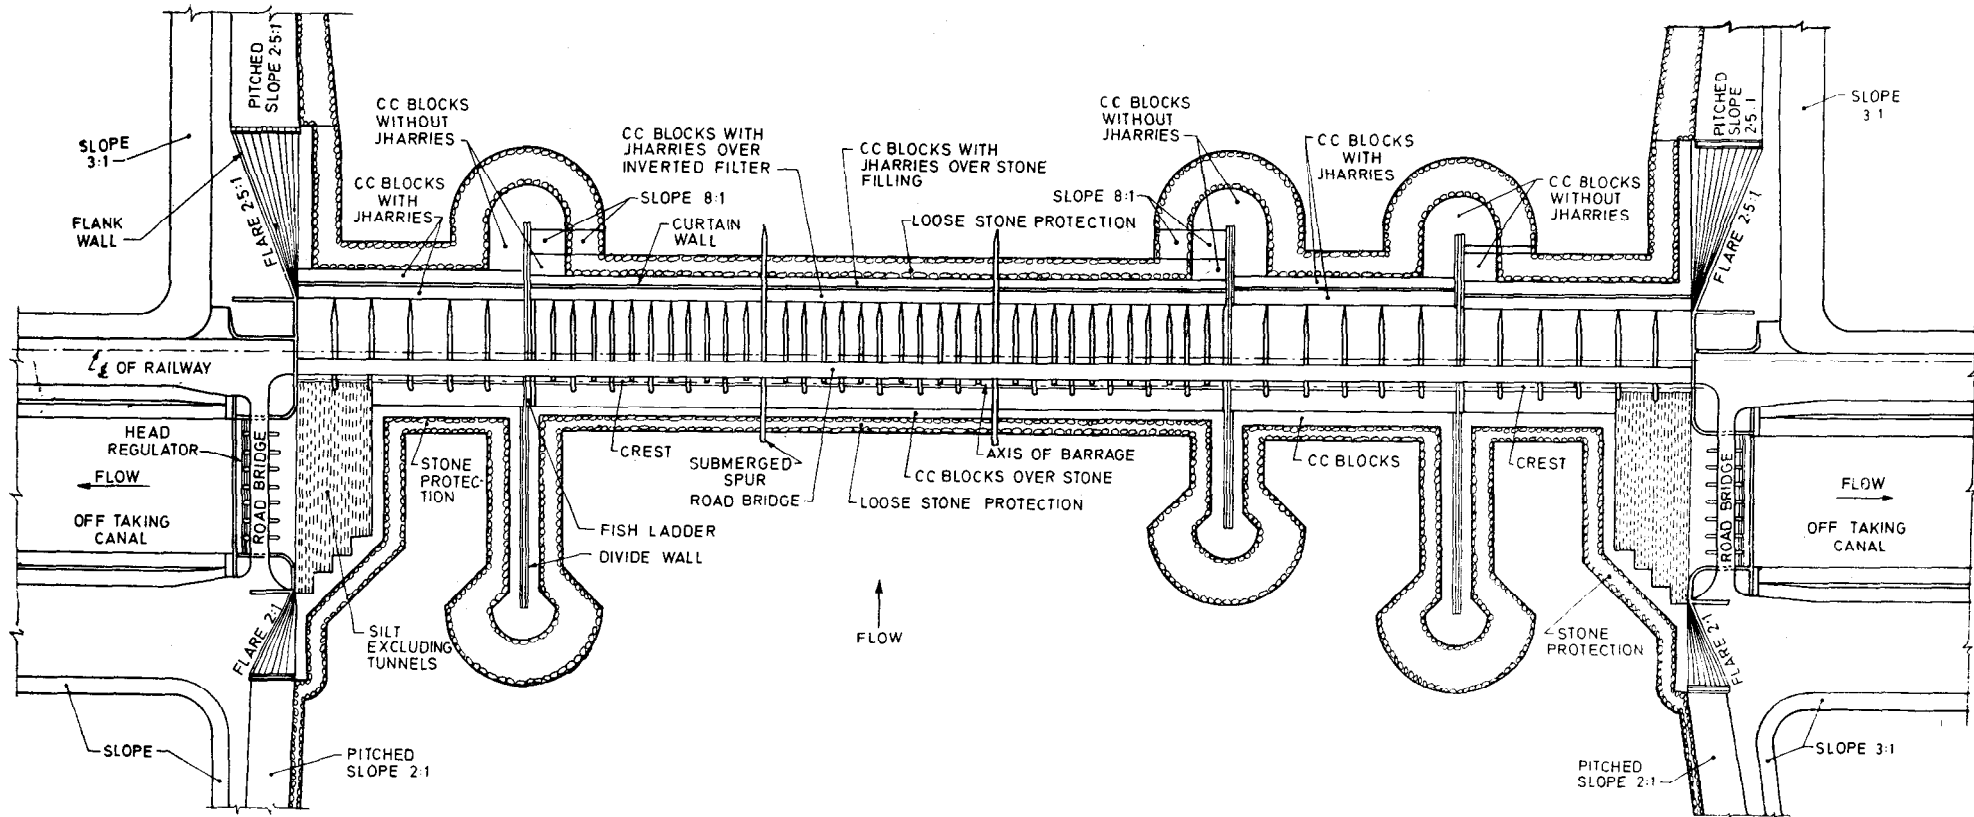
TYPICAL LAYOUT OF A BARRAGE
